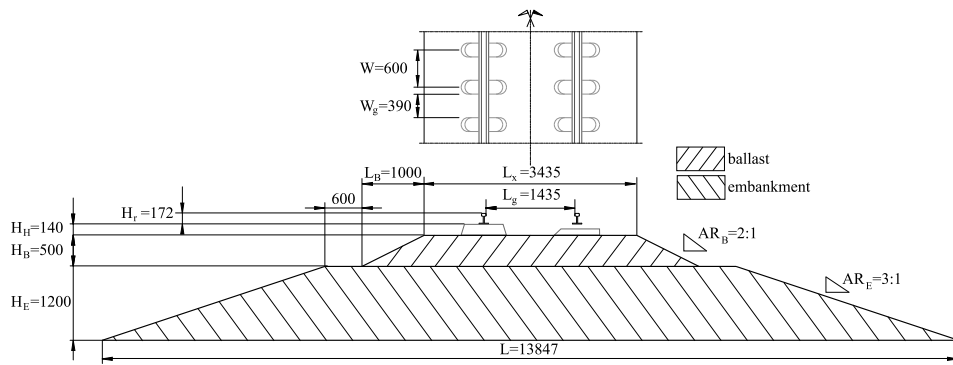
Cross section and plan view of the baseline railway system (dimensions in mm).
